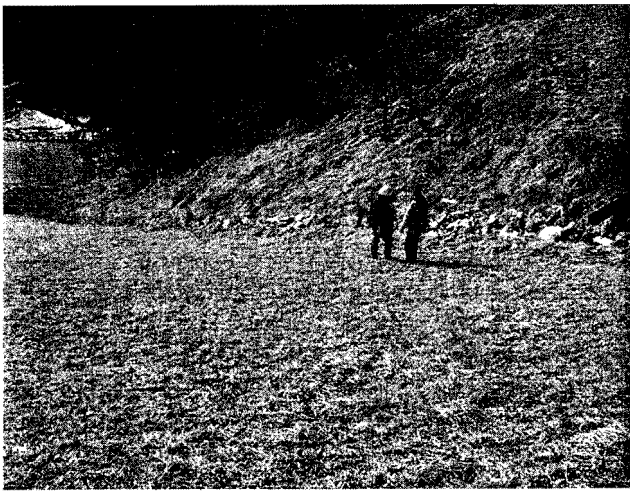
Photograph of right groin ditch formed by the right abutment and downstream slope of the dam and large drain pipe in right abutment that discharges into groin ditch
